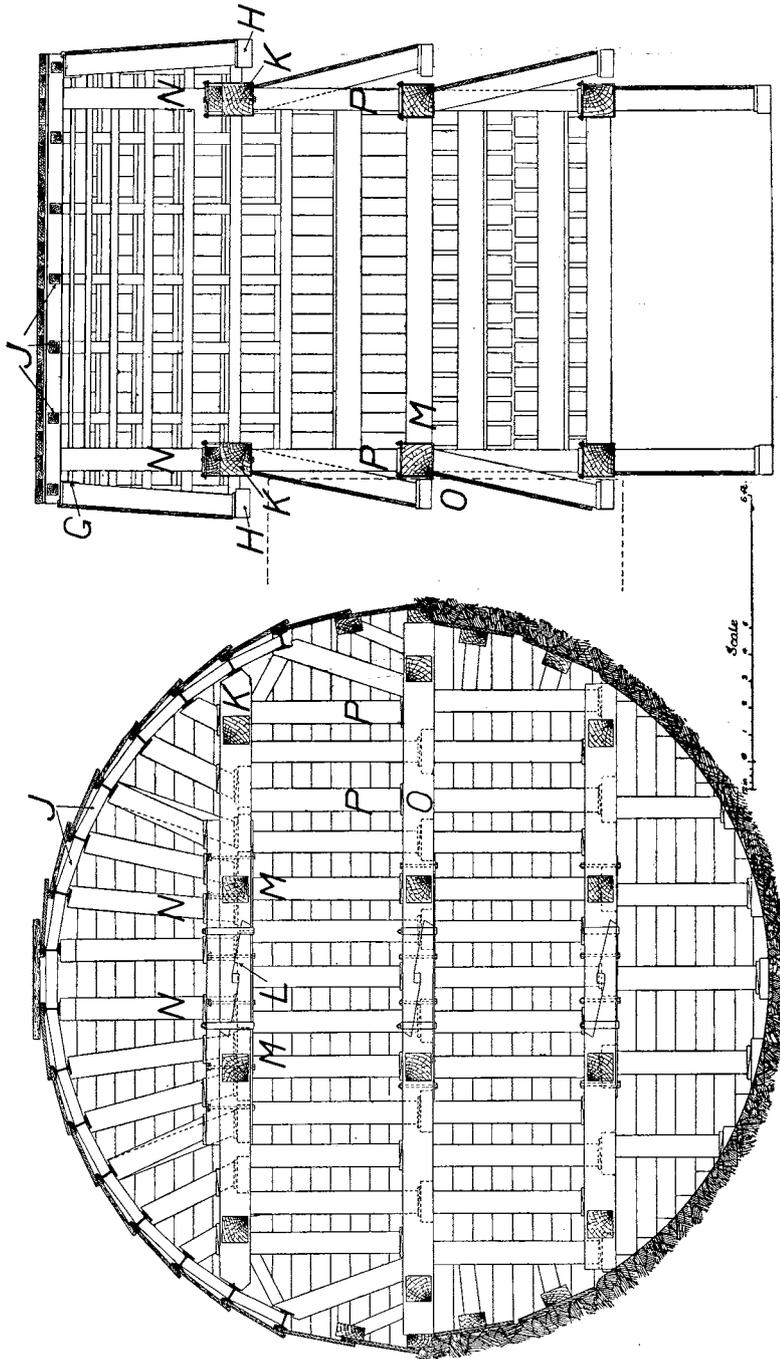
BAKER STREET AND WATERLOO RAILWAY, LONDON.
